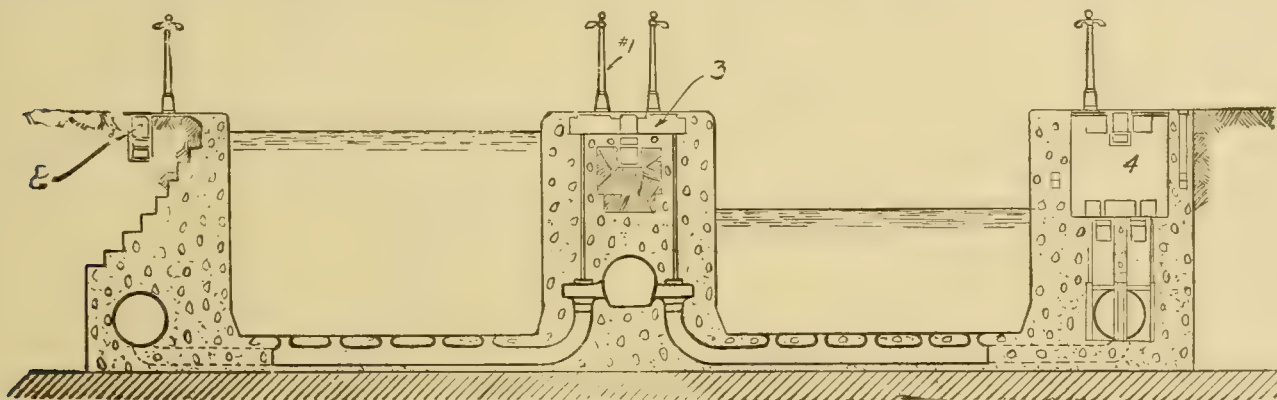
CROSS SECTION OF LOCKS SHOWING ILLUMINATION SYSTEM.
